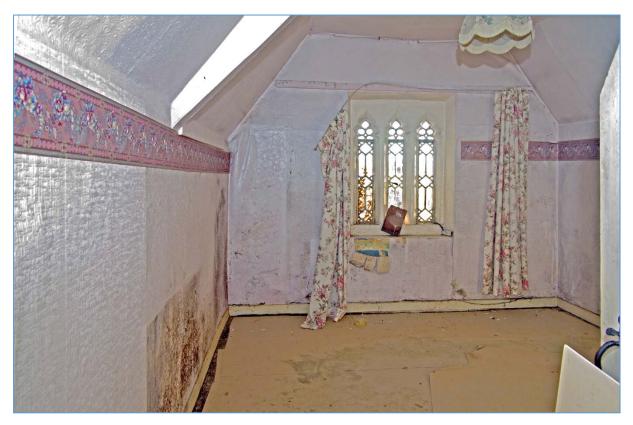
Upper chamber, looking to front. Truss foot on left hand wall
